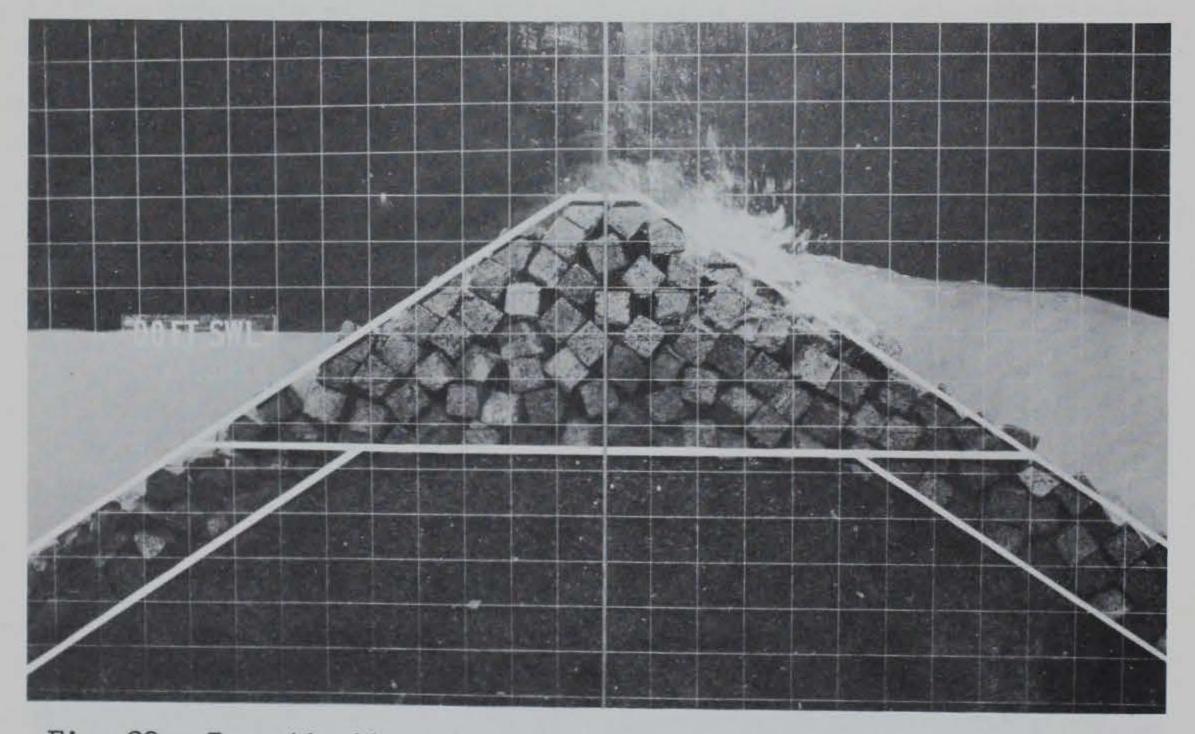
Investigation of the Epstein-Tyrrell formula, 10-sec waves, 26 ft high, attacking a rubble breakwater constructed of 36.4-ton, 2.8-specific-gravity, concrete-block cap rock placed on a 1-on-1-1/2 slope of friction of these cubes was found to average 1.34. These tests were conducted in the same manner as those performed to determine the accuracy of Iribarren's formula (paragraphs 43-48).
